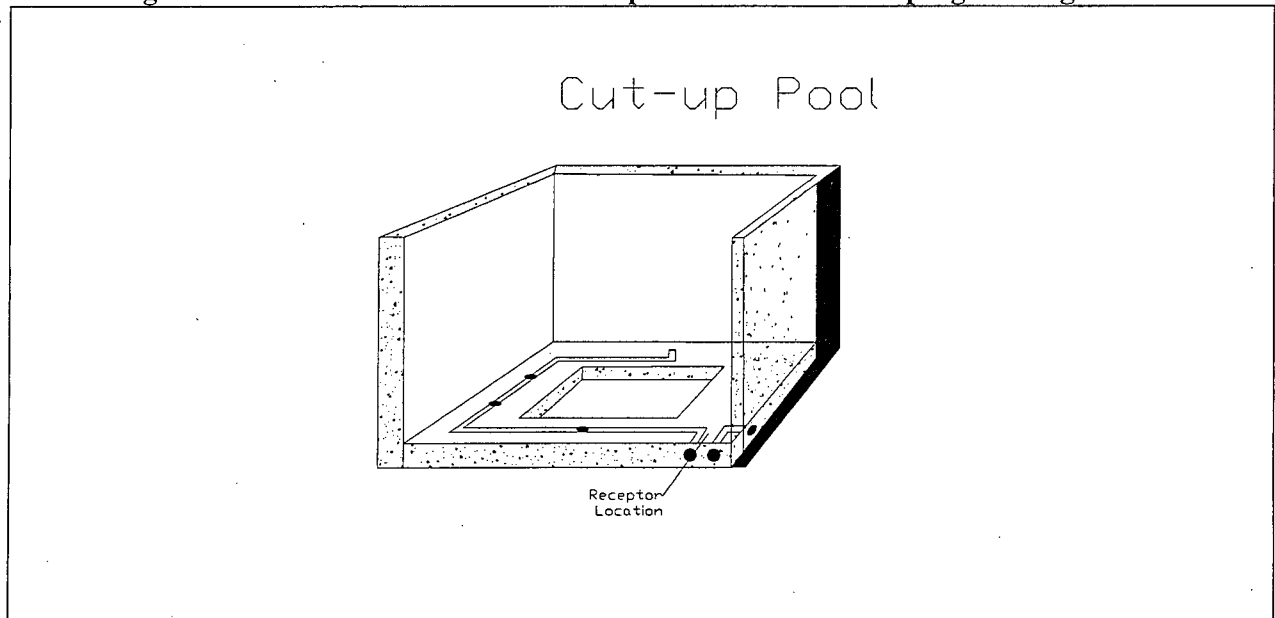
Cross Section view of Conceptual Dose Model Piping Arrangement
